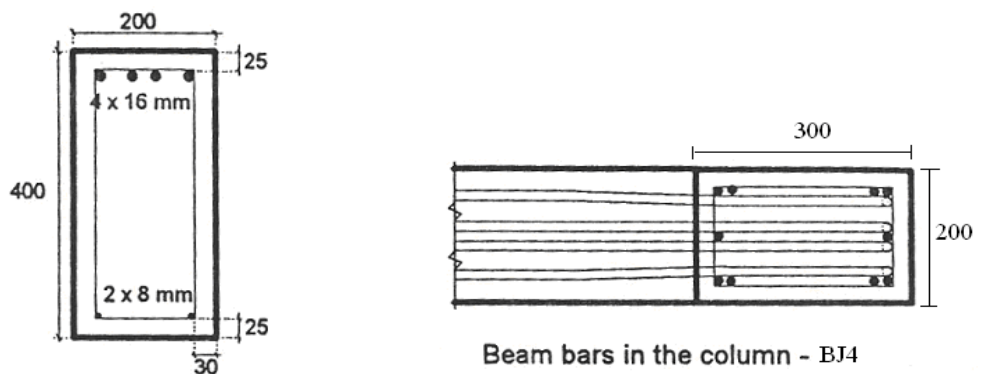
Column and beam cross sections for experimental test BCJ-4
